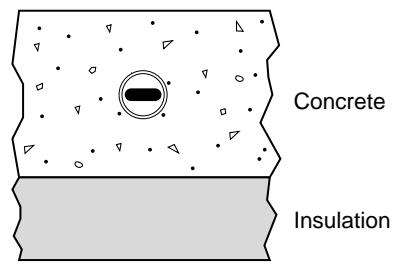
Heating cable inside electrical conduit embedded in the floor.
